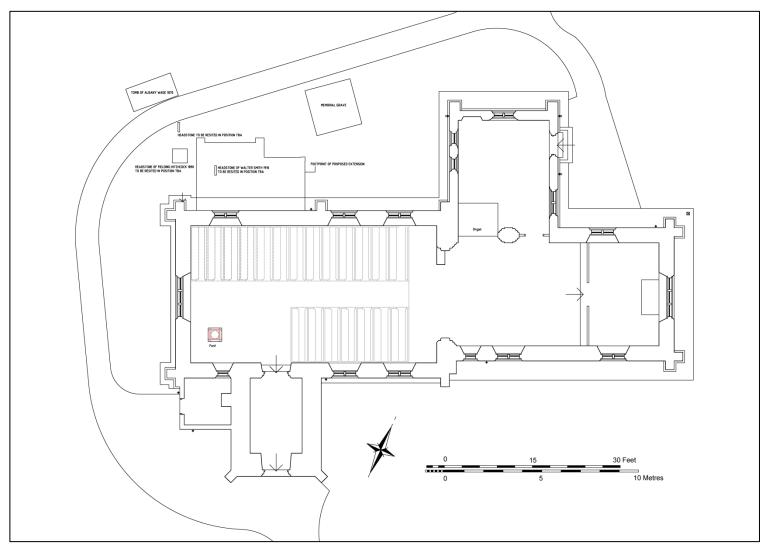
Existing floor plan (derived from drawing supplied by Pick Everard)
